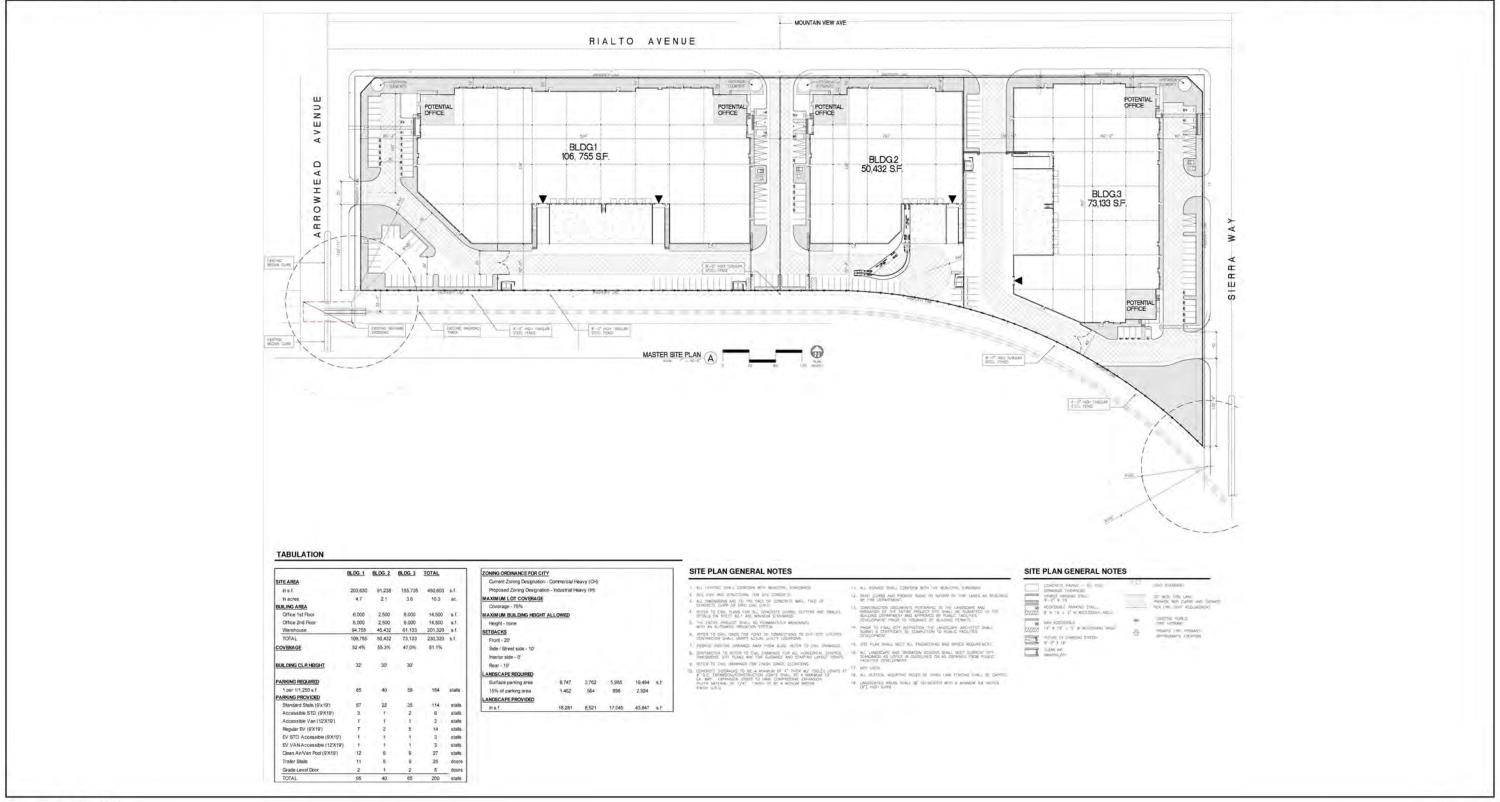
, *Conceptual Site Plan*, depicts the overall site plan proposed as part of the Project. As shown, the Project Applicant proposes to develop the 10.4 net-acre site with three non-refrigerated manufacturing/ business park buildings (herein referred to as Buildings 1, 2, and 3). Building 1, proposed in the western portion of the site, would contain approximately 106,755 s.f. of building area. Building 2, proposed in the central portions of the site, would contain approximately 50,432 s.f. of building area. Building 3, proposed in the eastern portions of the site, would contain approximately 73,133 s.f. of building area.
